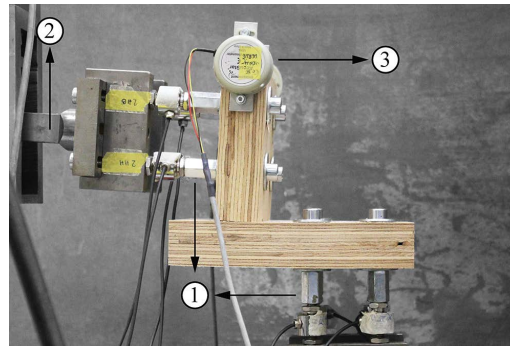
Bending test setup developed by Roche [83]: ① Four load cells ② Lever arm connected to a 20 kN load cylinder ③ Two inclinometers, fixed to the panel with tenon.
